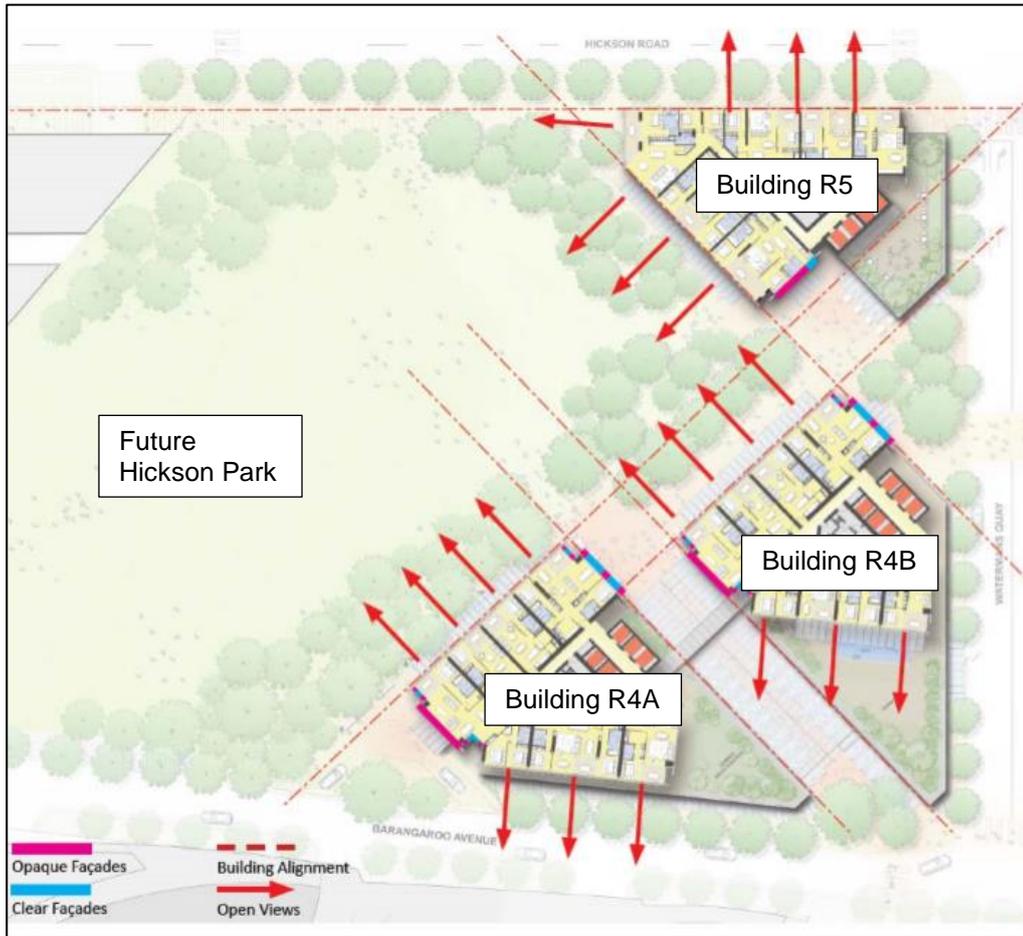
Orientation of buildings to primary views (Base source: RTS)
